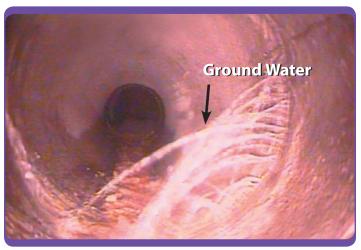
Groundwater entering a sewer pipe through cracks
